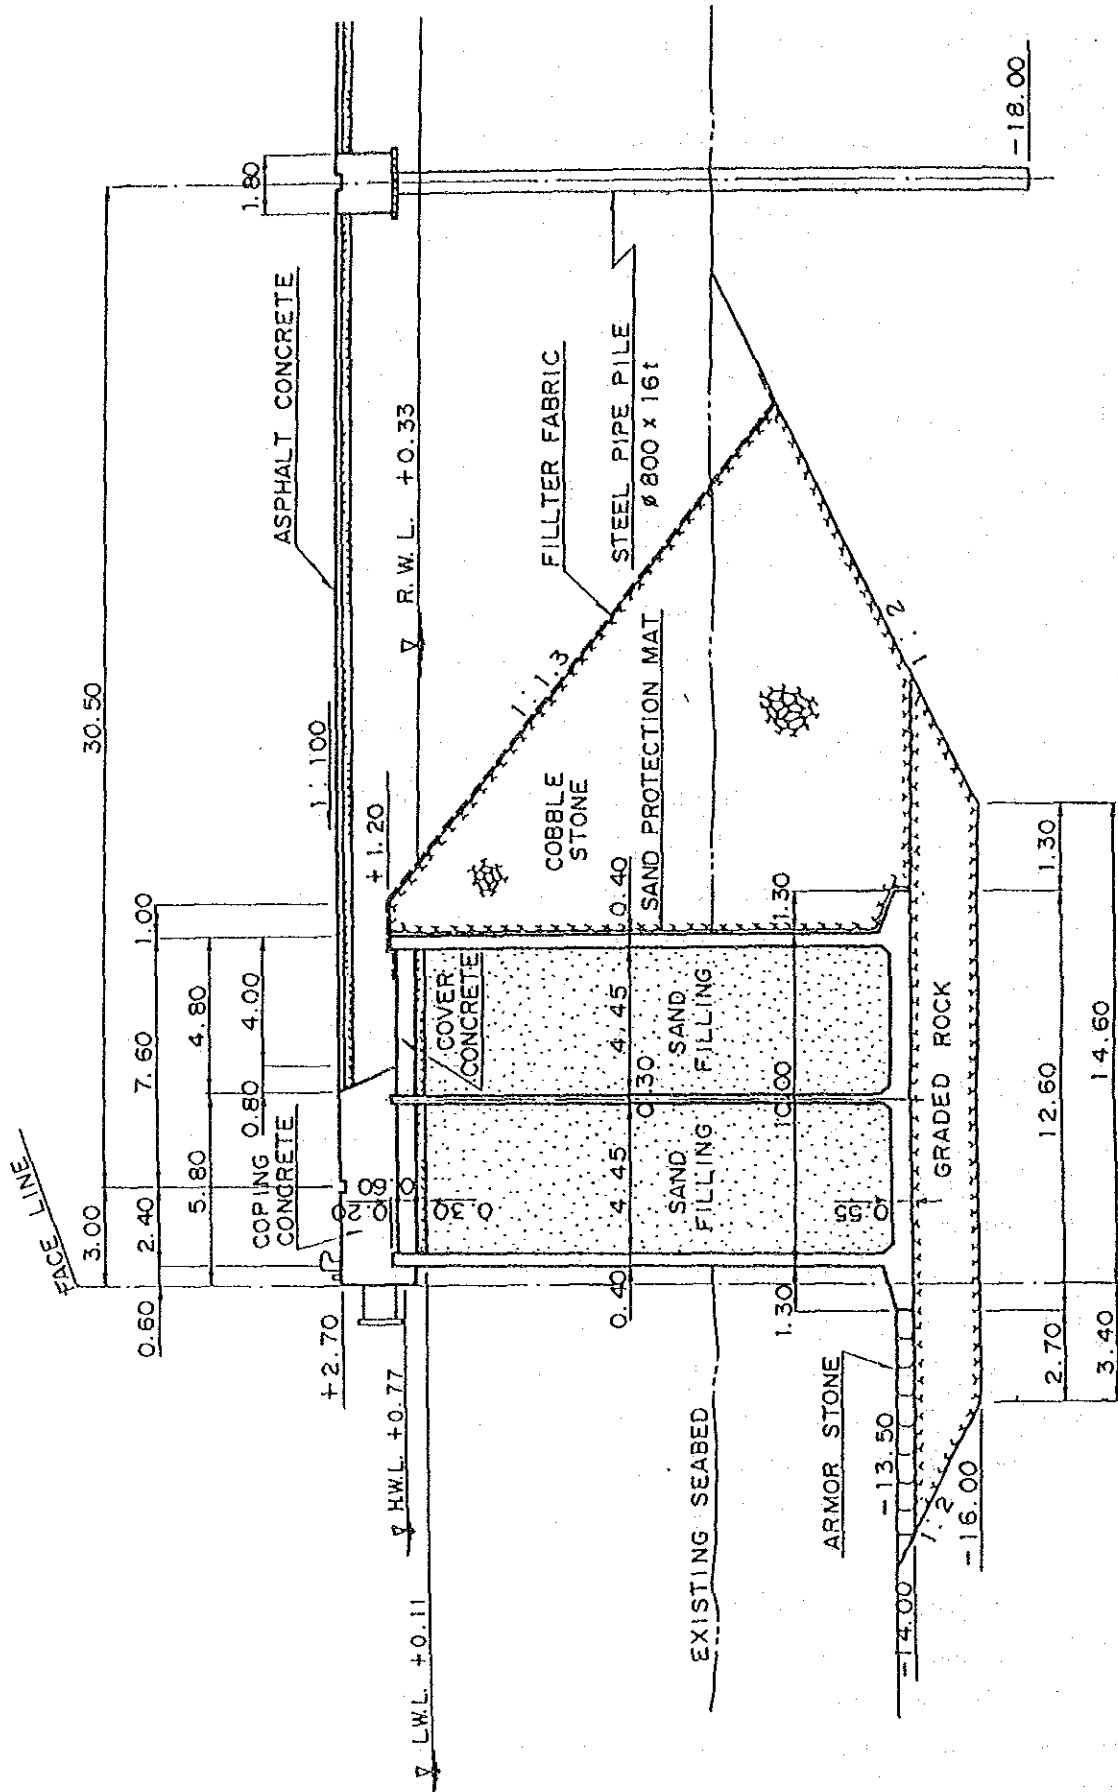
Typical Cross Section of JCT -13.5 m Quaywall (Solid Wall Type Concrete Caisson)
